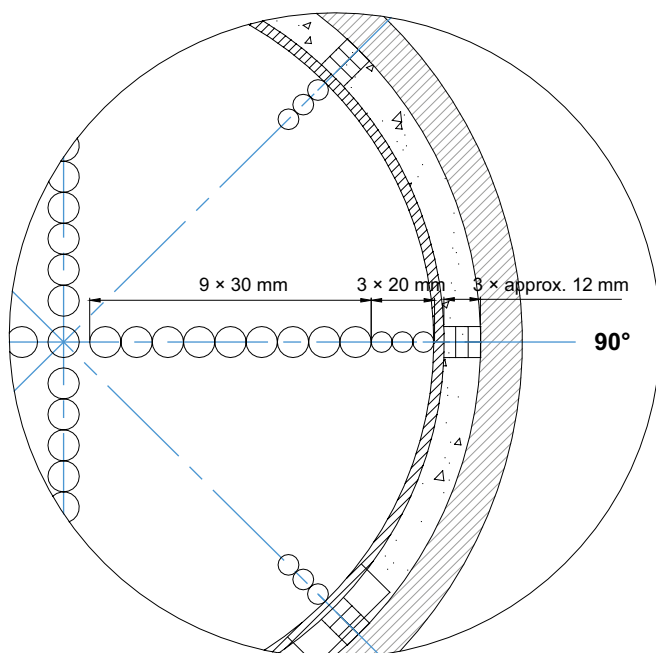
BB II. Close-up of a cross section profile showing the sampling plan.
